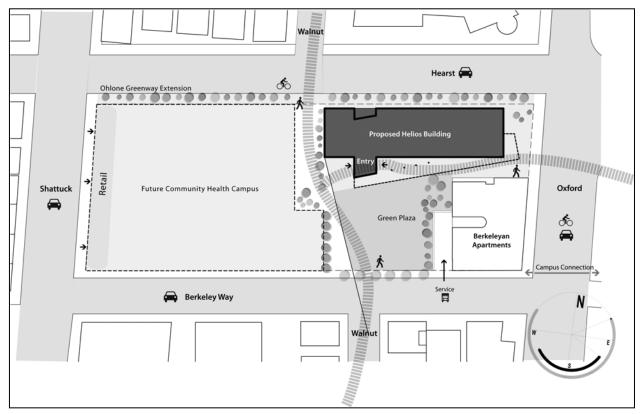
Proposed site plan, incorporating Helios building, Community Health Campus, Shattuck retail, green plaza, Walnut Street path
